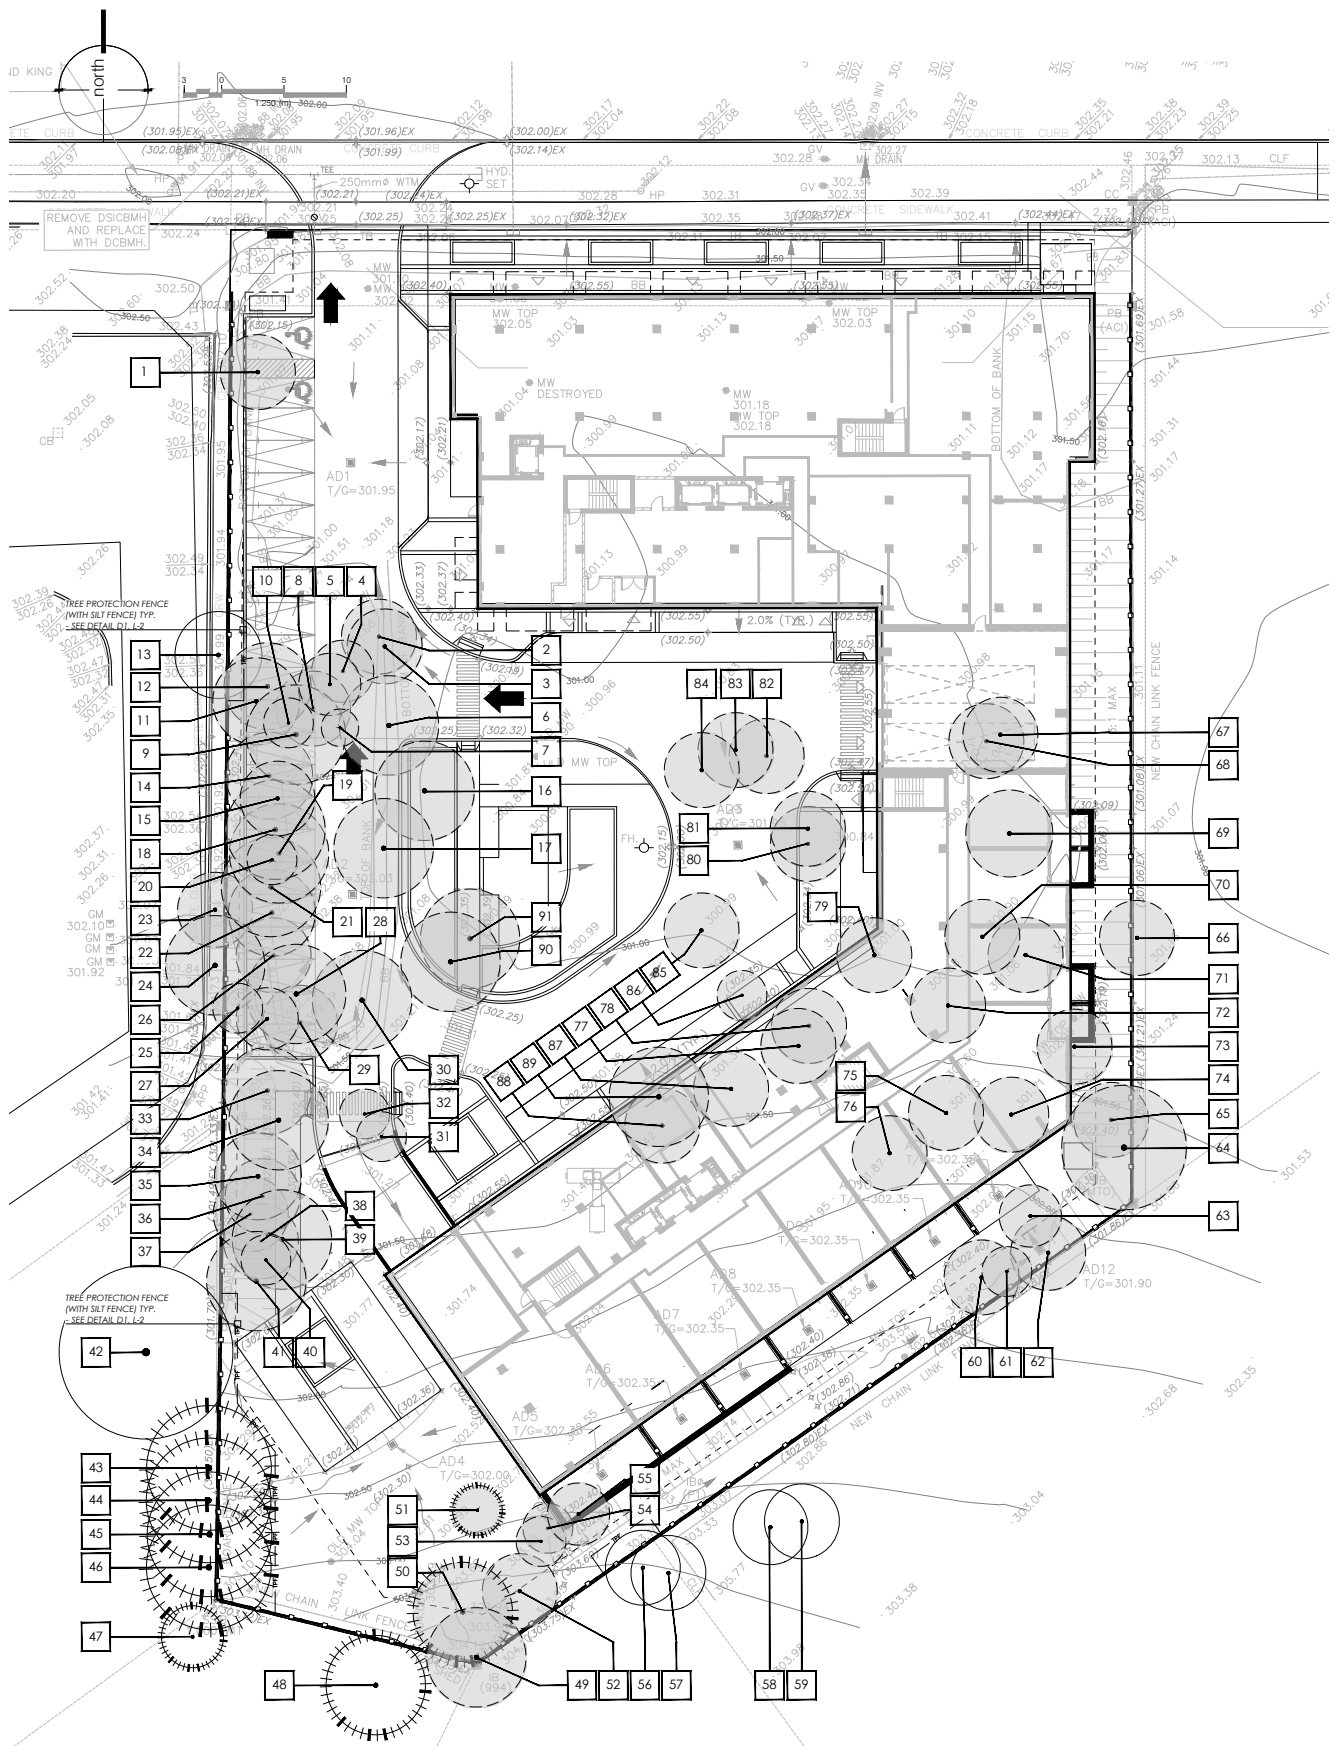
Tree Protection Plan prepared by Adesso Design Inc.
